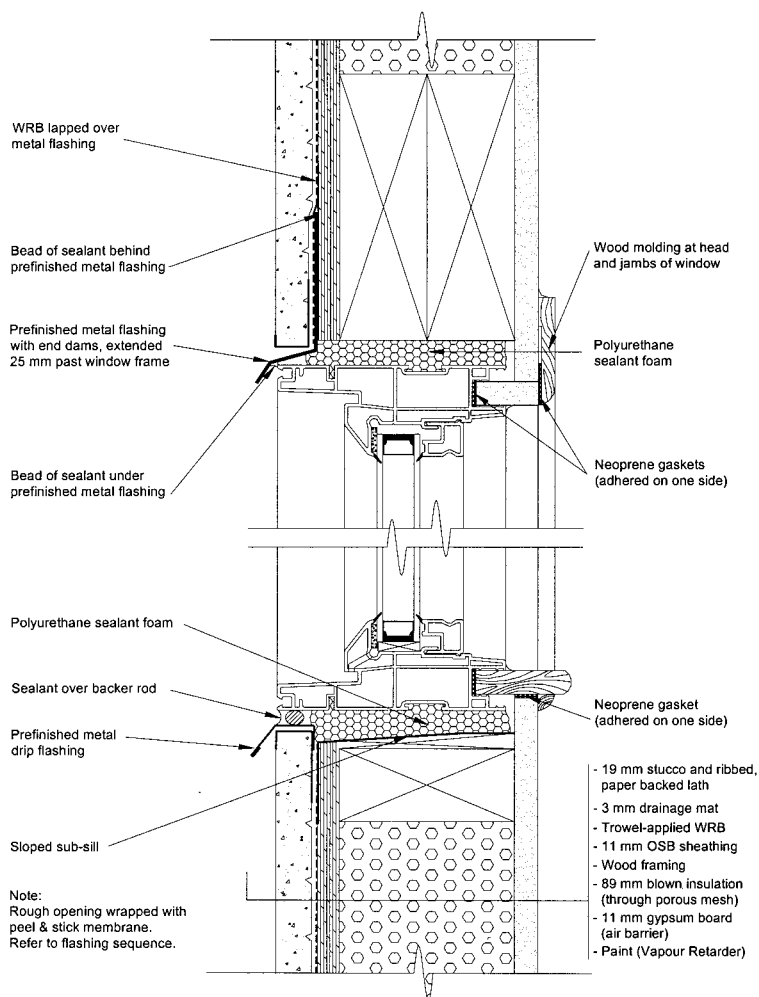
Wall/window interface between a box frame window and the wood-frame wall designed for an ADA system. The wall construction includes a Portland cement plaster cladding system with a drainage mat. (From Desmarais and Bomberg, 2000).
